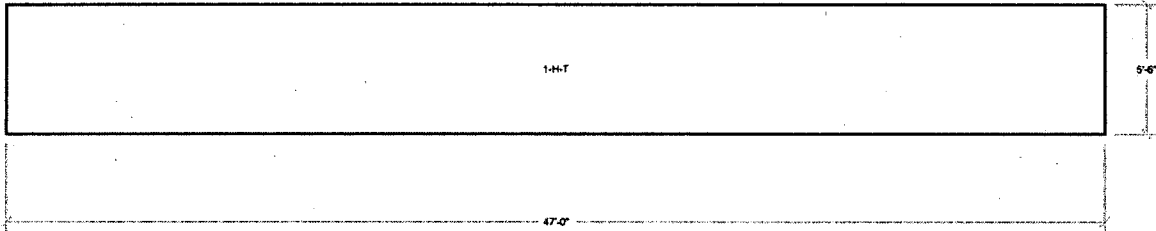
H.7-17. Tunnel and Access Region Basemat Looking Down Transverse Reinforcement Zones
